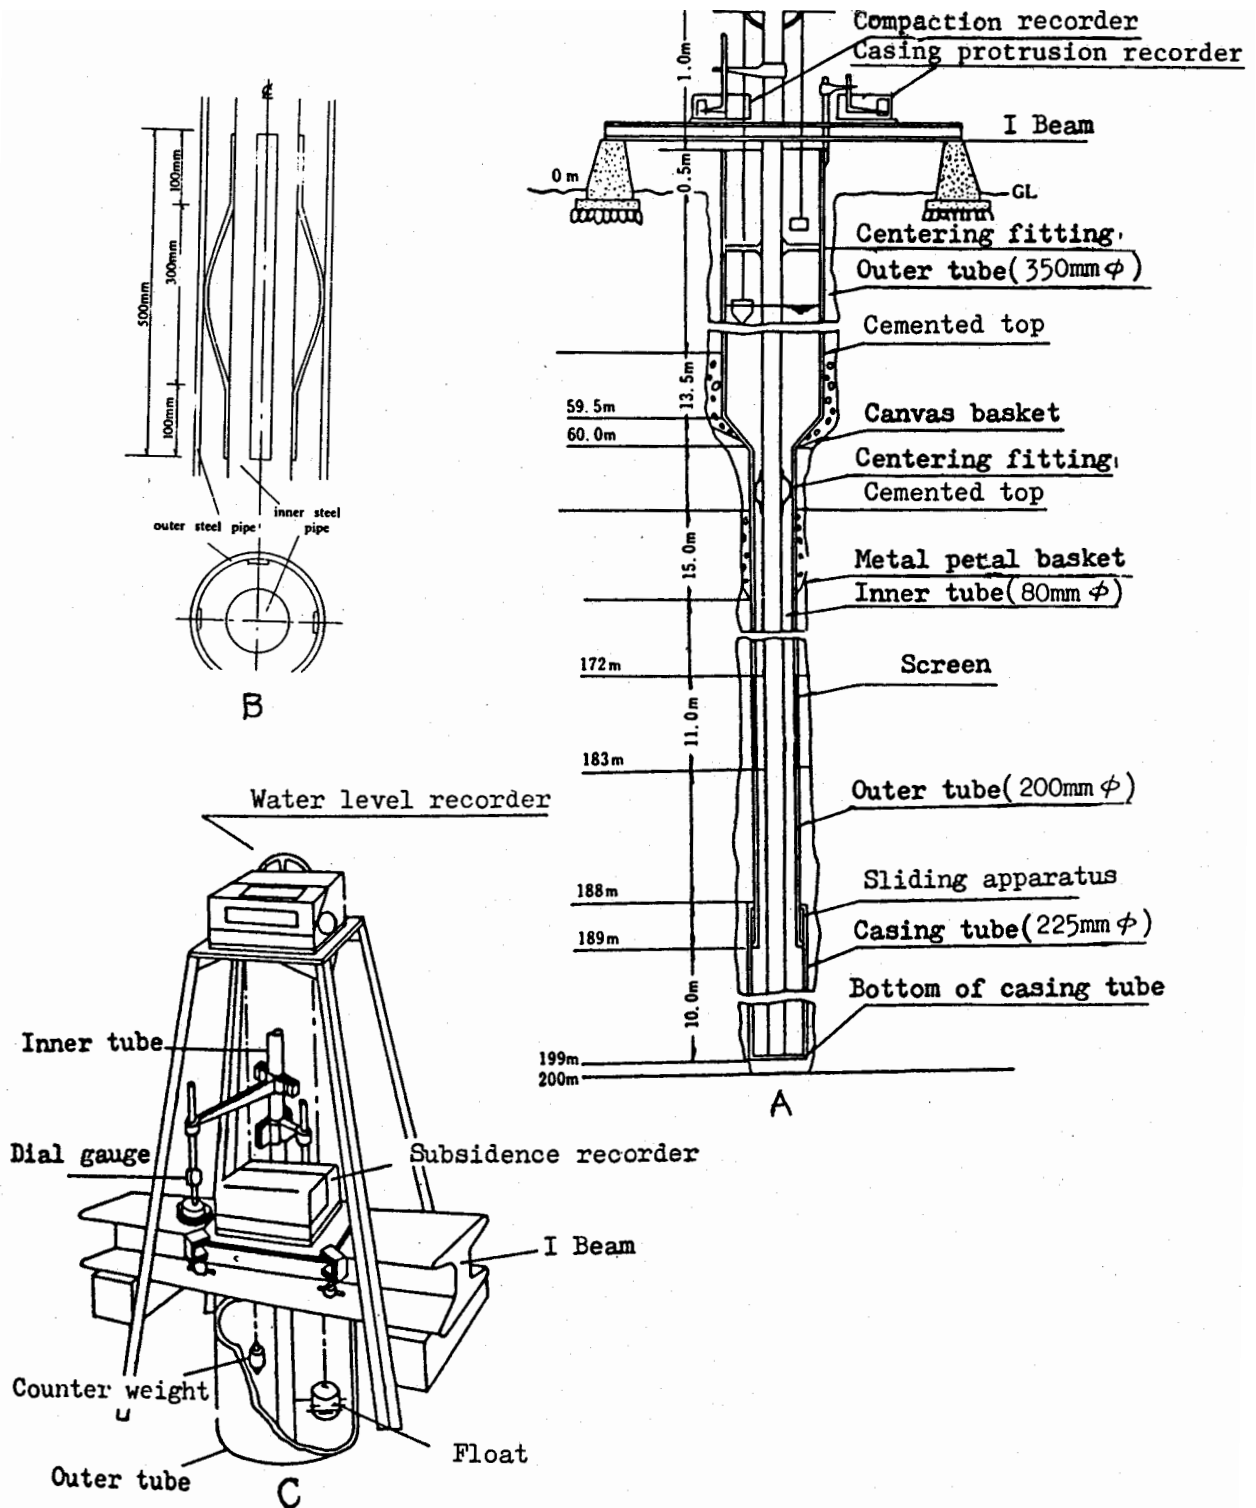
Structure of Funabashi observation well (double-tube type). A, Sectional view; B, Centralizer detail; C, Recorder detail.
